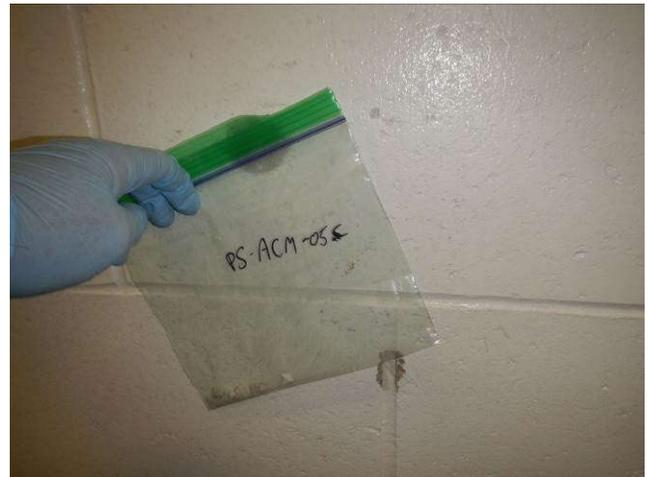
Sample location PS-ACM-05C, grey mortar, interior wall of "choline storage room" in Pumping Station Building.
